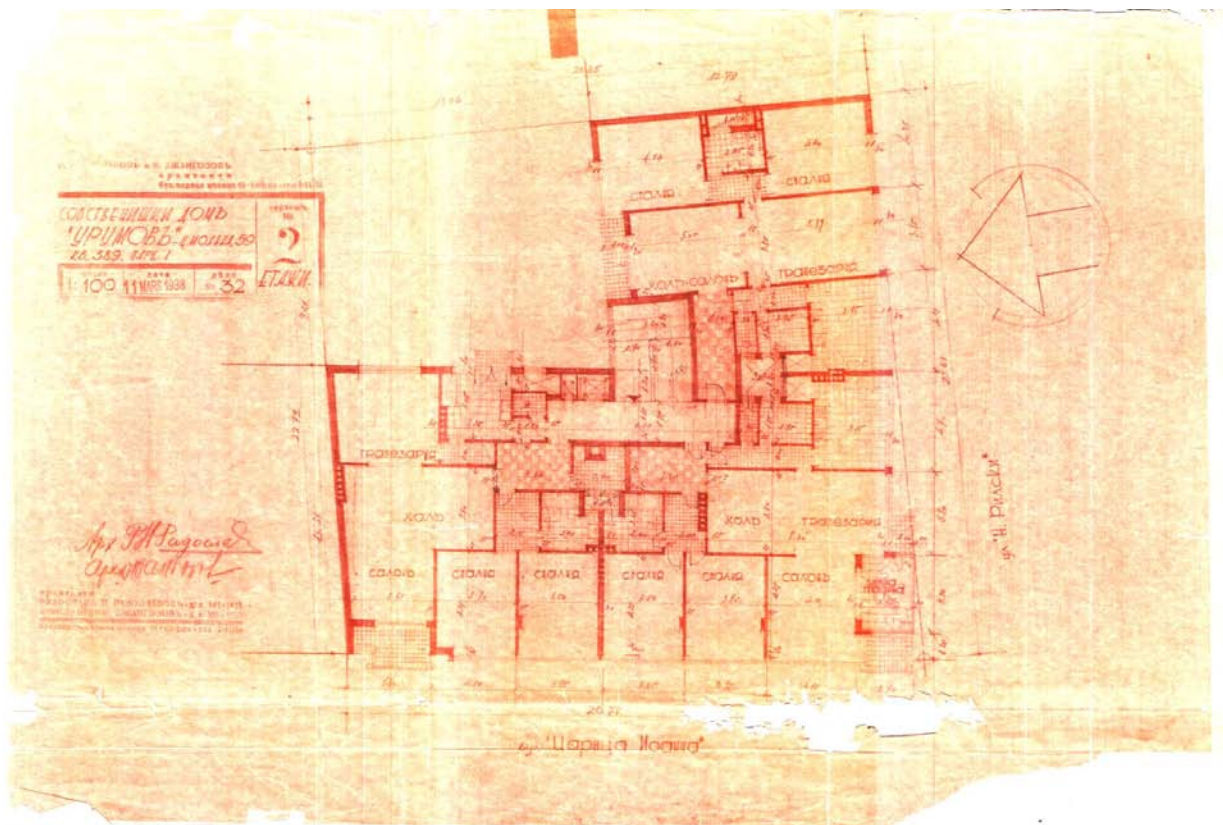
Floor plan of *Ouroumov* cooperative residential building at the corner of Vitosha Blvd. and Neofit Rilski St., Architects Radoslav Radoslavov and Konstantin Dzhangozov
